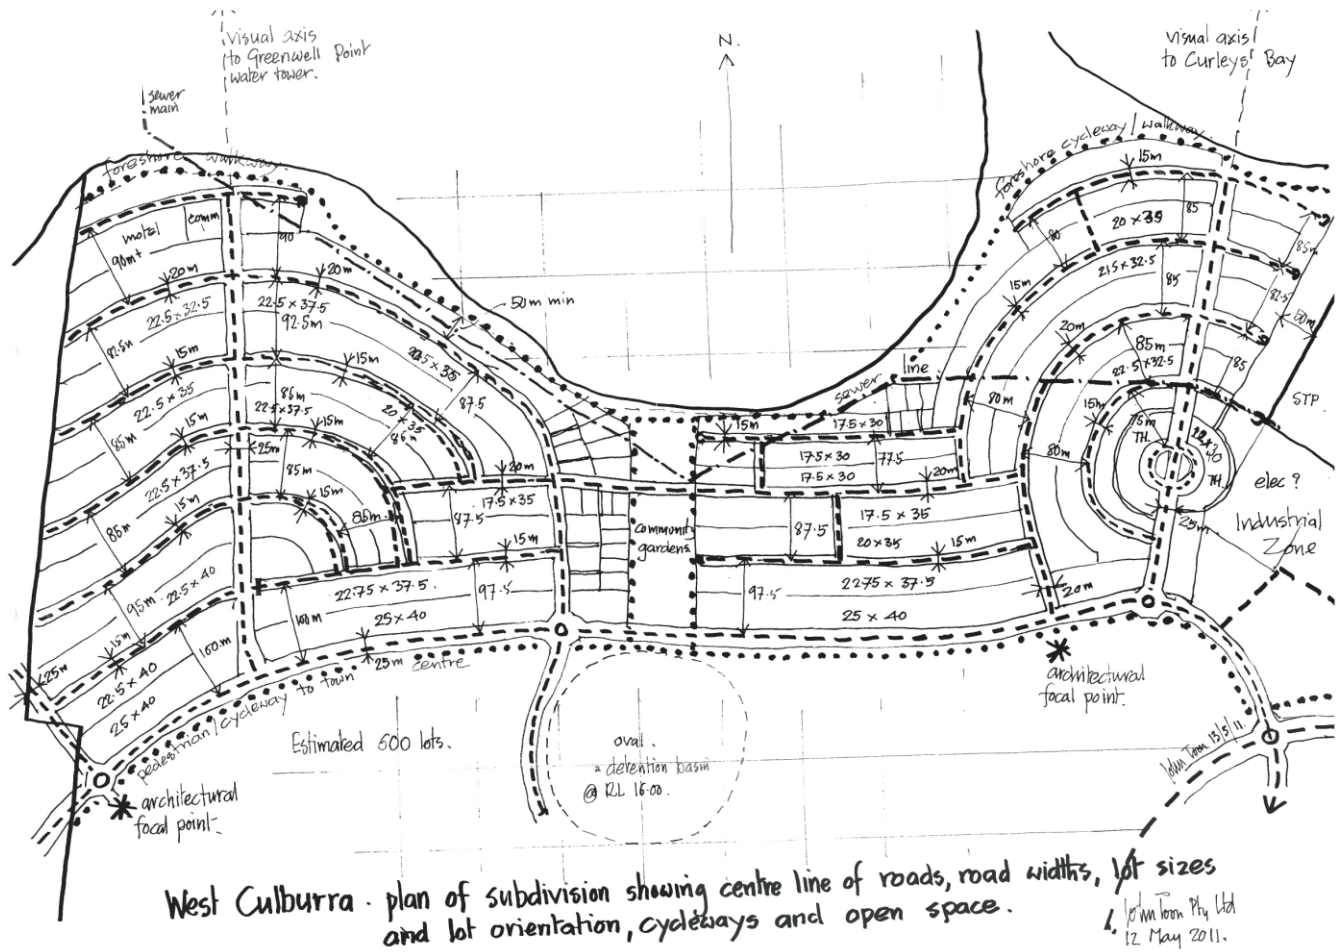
West Culburra concept layout plans (courtesy John Toon and Allen, Price & Associates).
